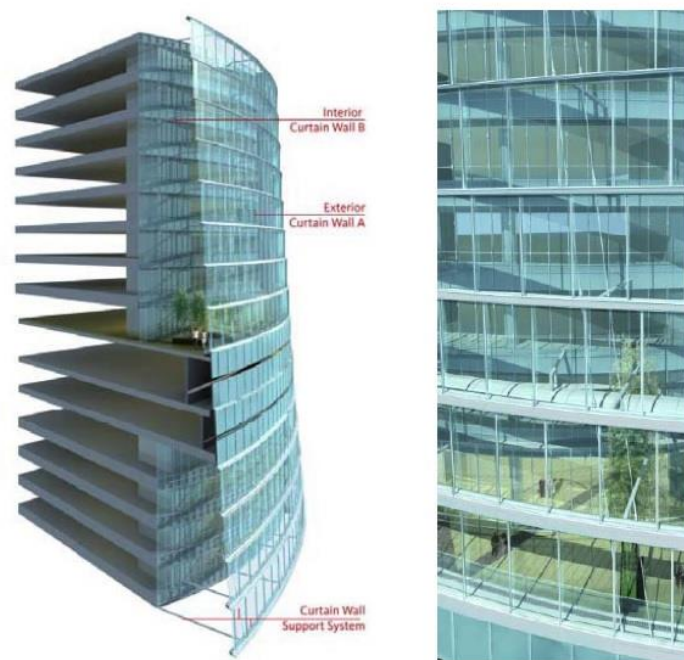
Curtain wall system description (Shanghai Tower Façade Design Process, 2010)
